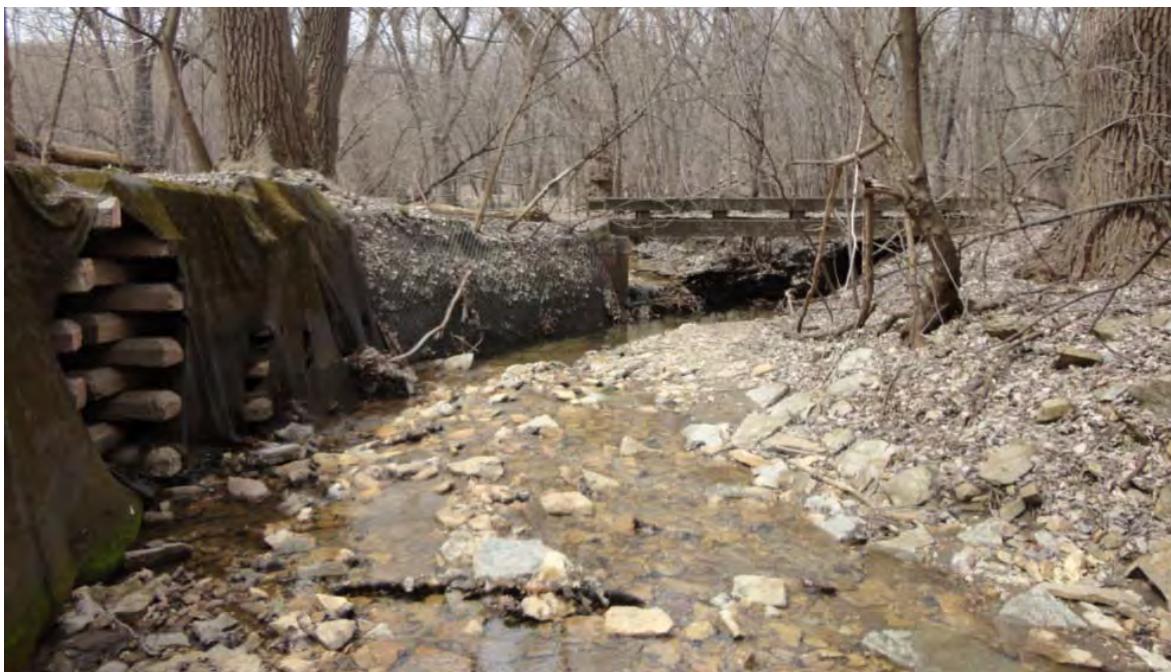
Alluvial Fan Reach - Bank erosion project on channel left looking downstream at Station 6+00 to bridge #2 crossing
